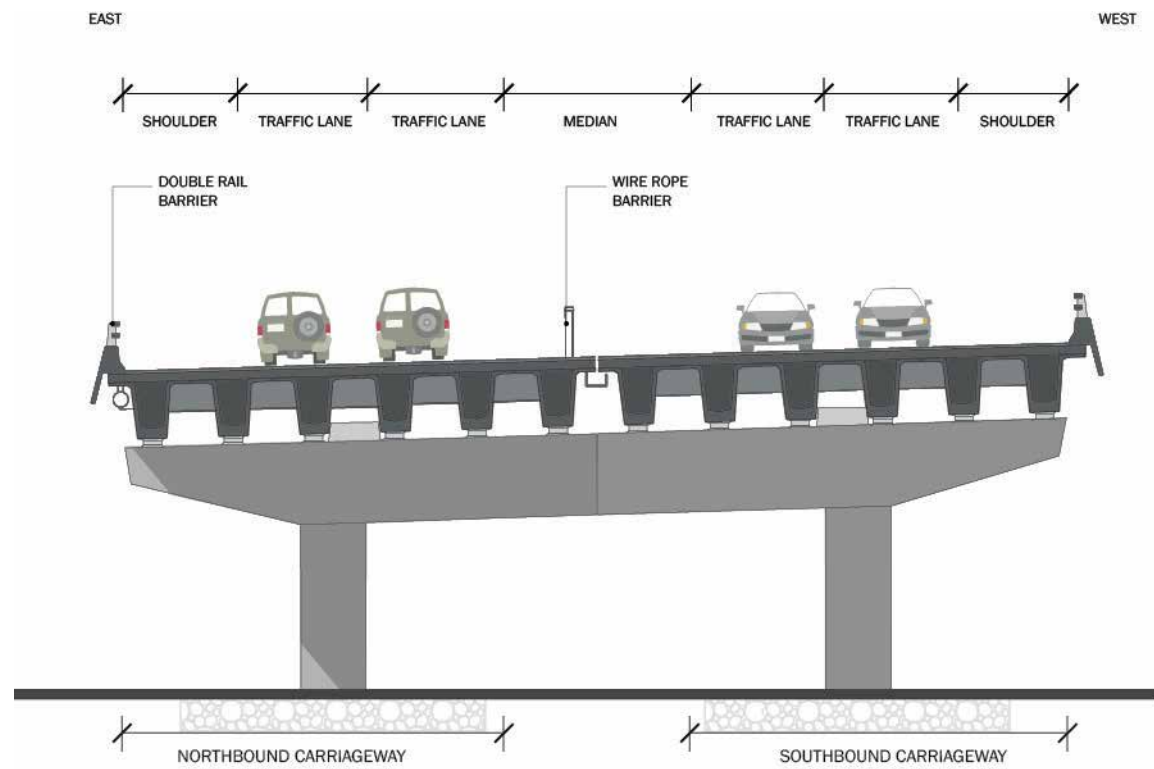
Section – Bridge SB07: Berry Bridge
